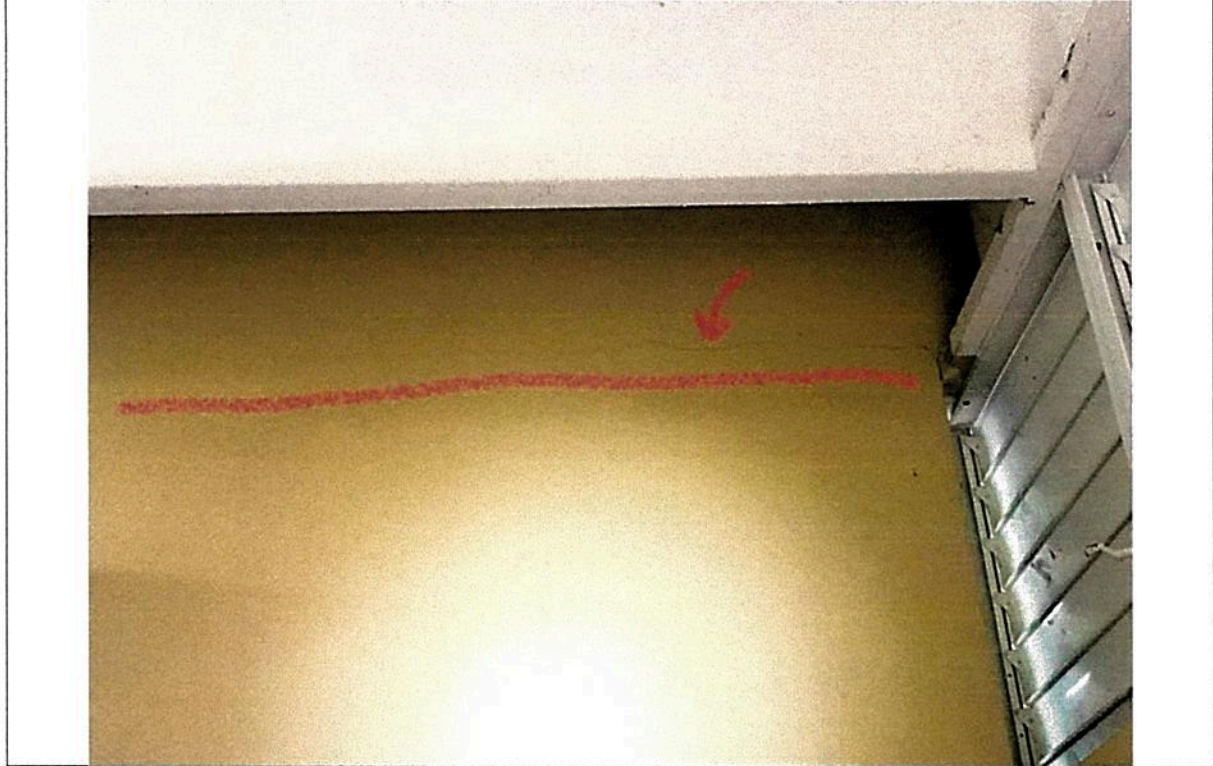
Separations at building expansion joints causing cement plaster to break and fall.
